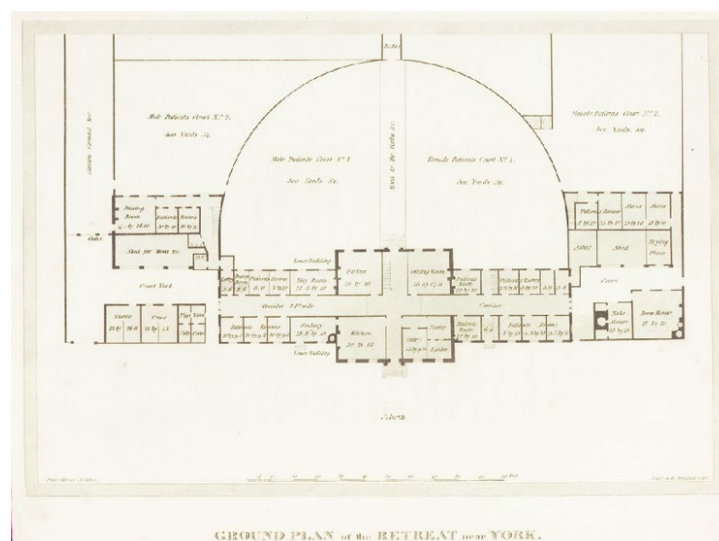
Ground plan of the Retreat of York (Kibria & Metcalfe, 2014).
